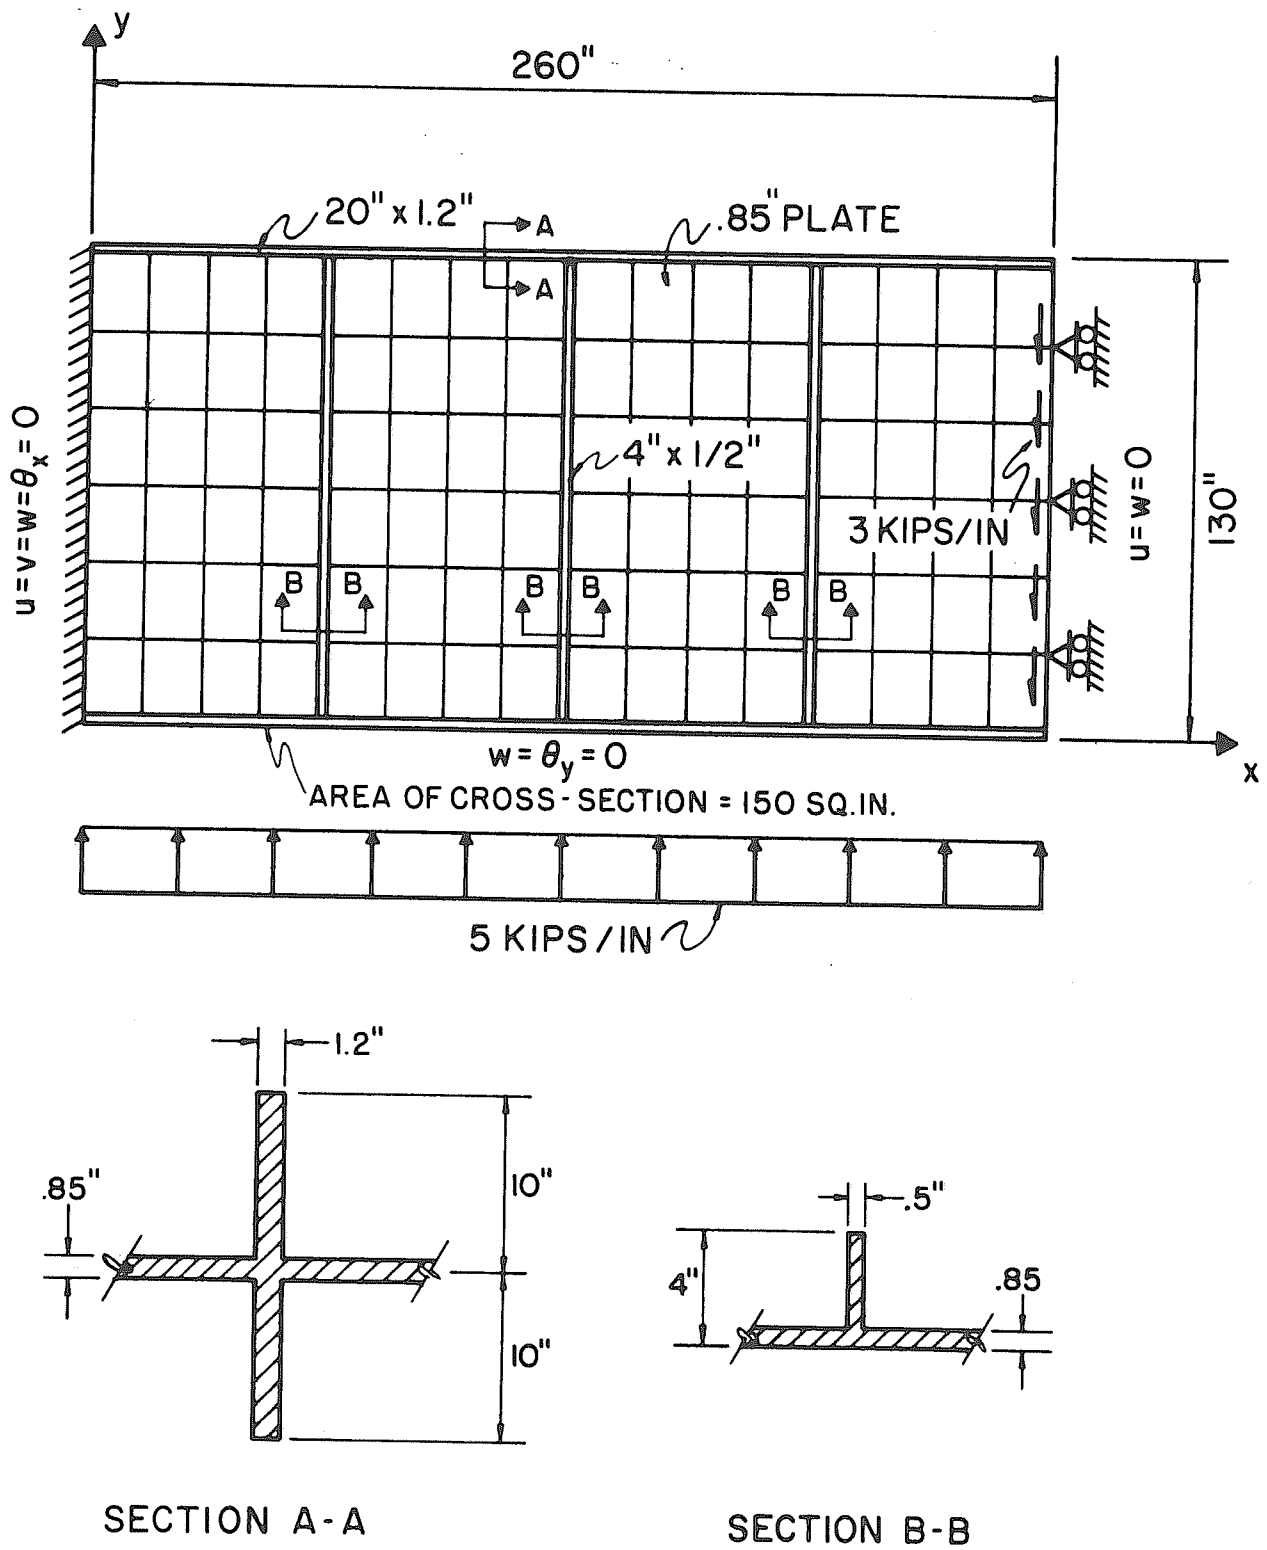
GIRDER WEB, GEOMETRY, LOADING AND FINITE ELEMENT MESH
